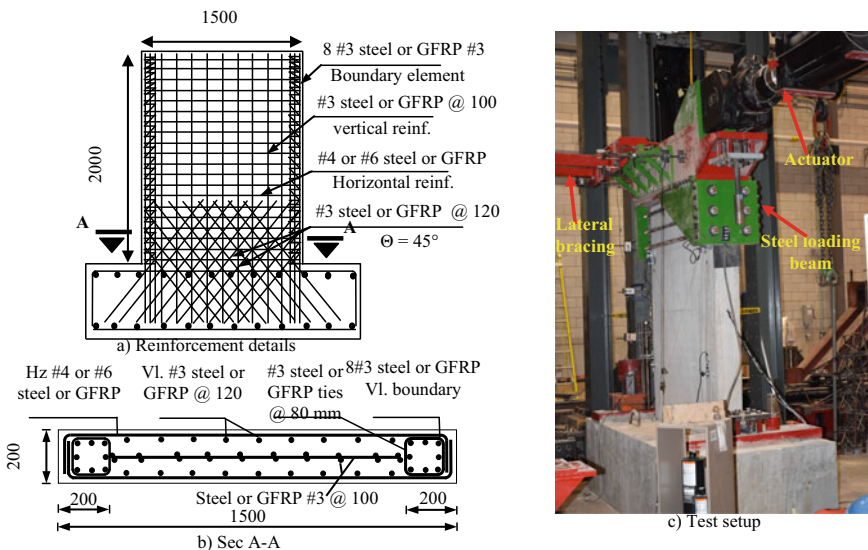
Concrete dimensions, reinforcement details, and test setup for the test specimens (S4-80, and G4-80)
